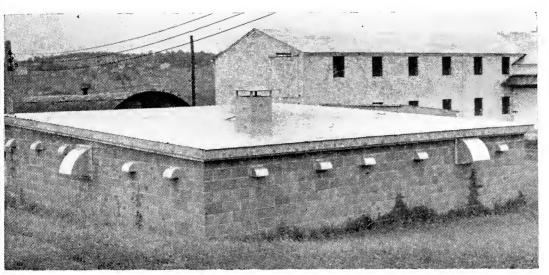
Windowless house showing original ventilation system of 24-inch exhaust fan in center of roof and small, hooded intake openings. This system was discarded in favor of a pressurized system. The large hoods in the walls cover the intake fans and exhaust openings.
